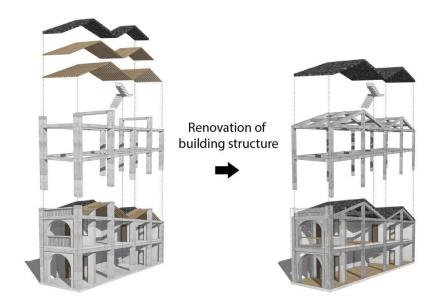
Renovation of building structure (Source: designed and drawn by author)
